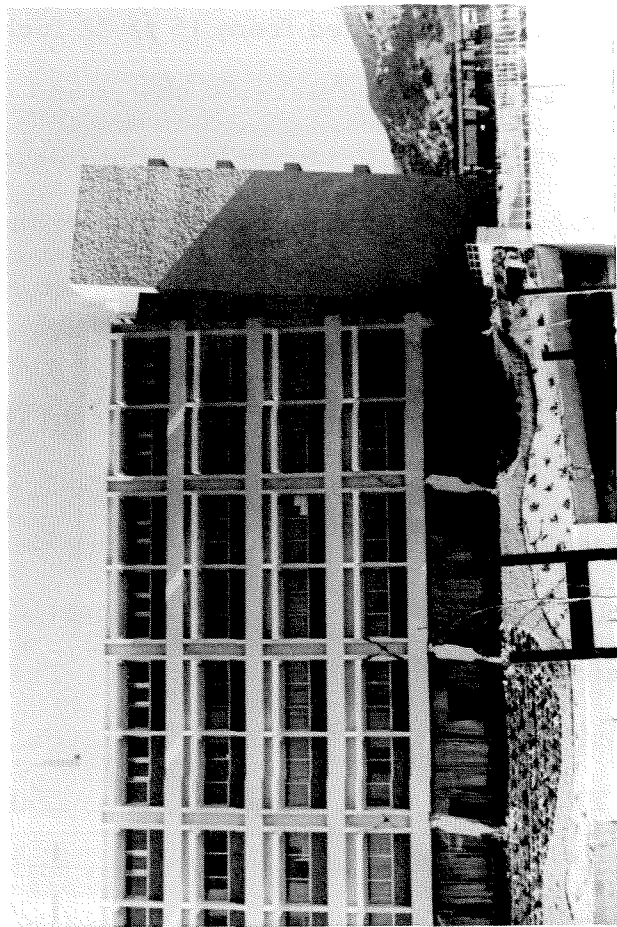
Looking west at the leaning north stair tower, Olive View Hospital. This stair tower was supported on footings, whereas the other three stair towers, which fell, were supported from below on the basement frame. The garden in the foreground was originally horizontal.
